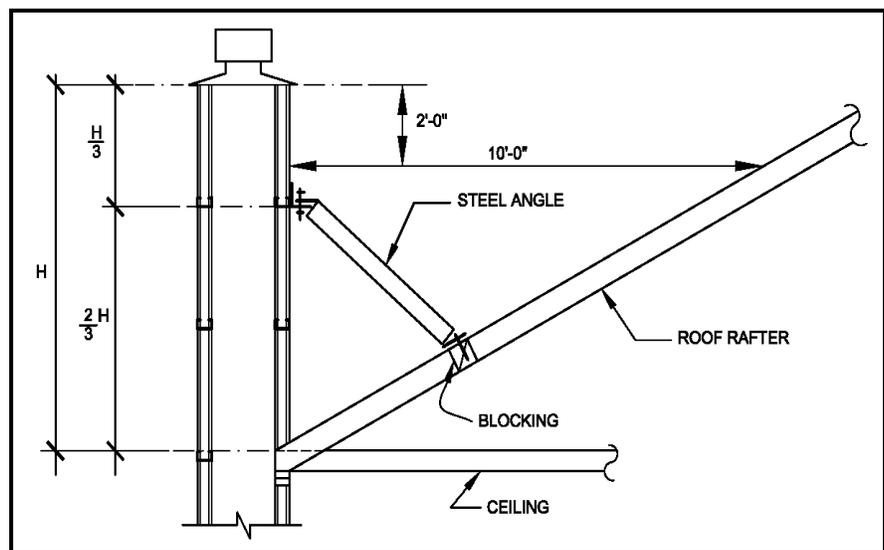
Bracing of light-frame chimney chase to roof (Alternatives B and C).
